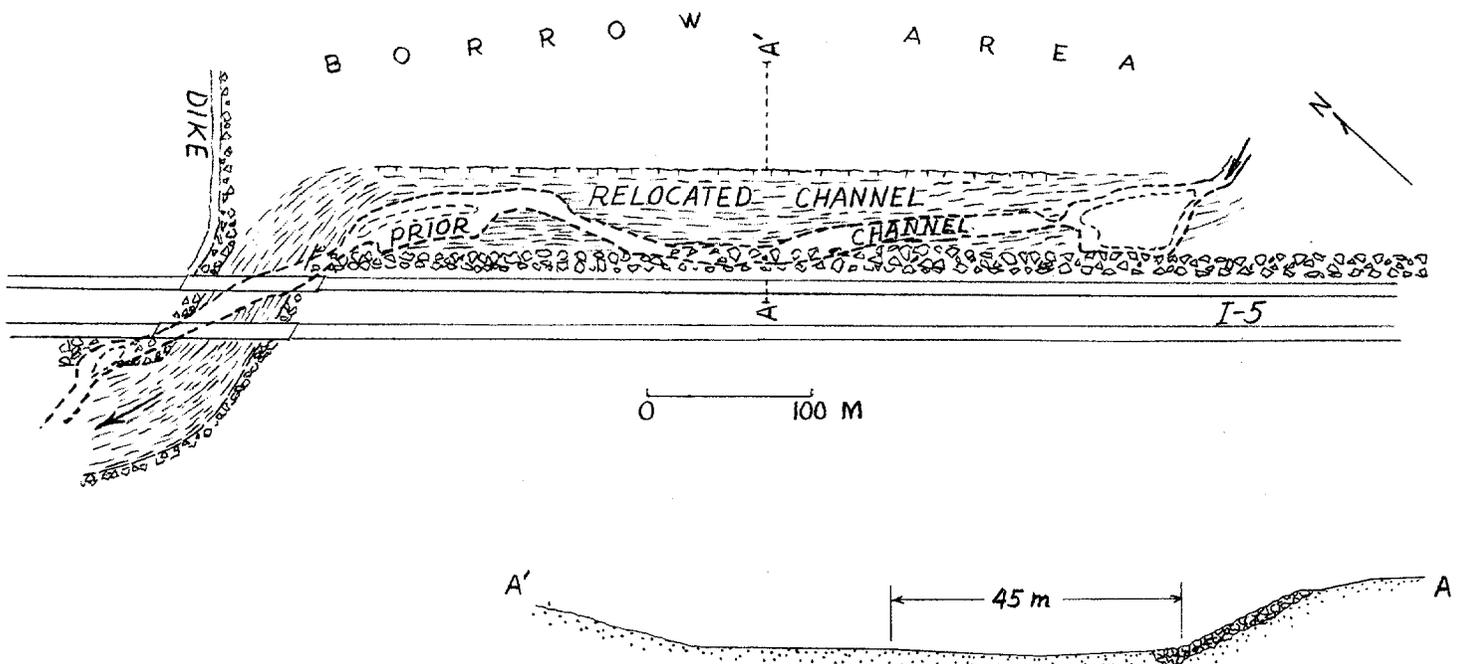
Plan sketch and cross section of Bear Creek channel alteration.
